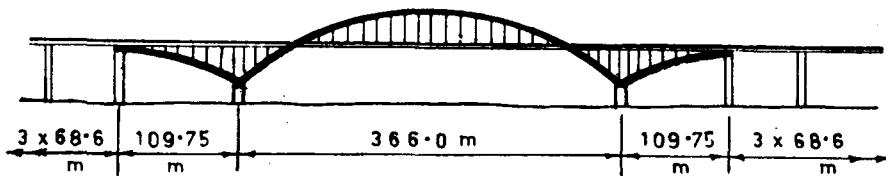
PORTMANN BRIDGE (O'Connor)<sup>6</sup>
